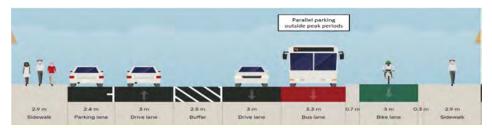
Option 1 – Hutt Road Indicative Plan and Cross Section
